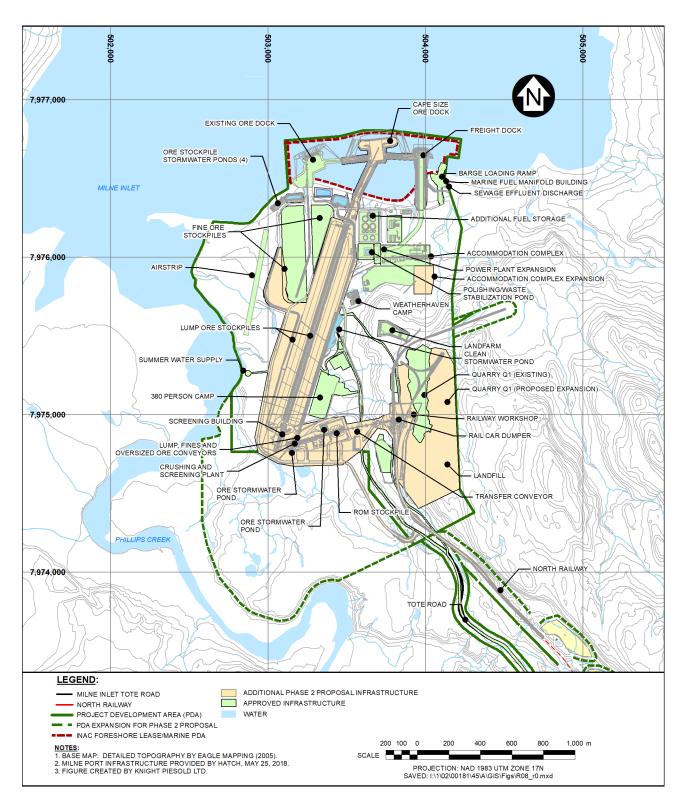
Milne Port - Phase 2 Proposal Layout
